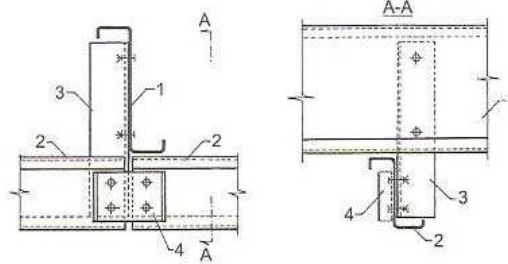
Cold-formed girt to cold-formed column connection: 1- column, 2- cold-formed angle, 4- cold-formed channel
